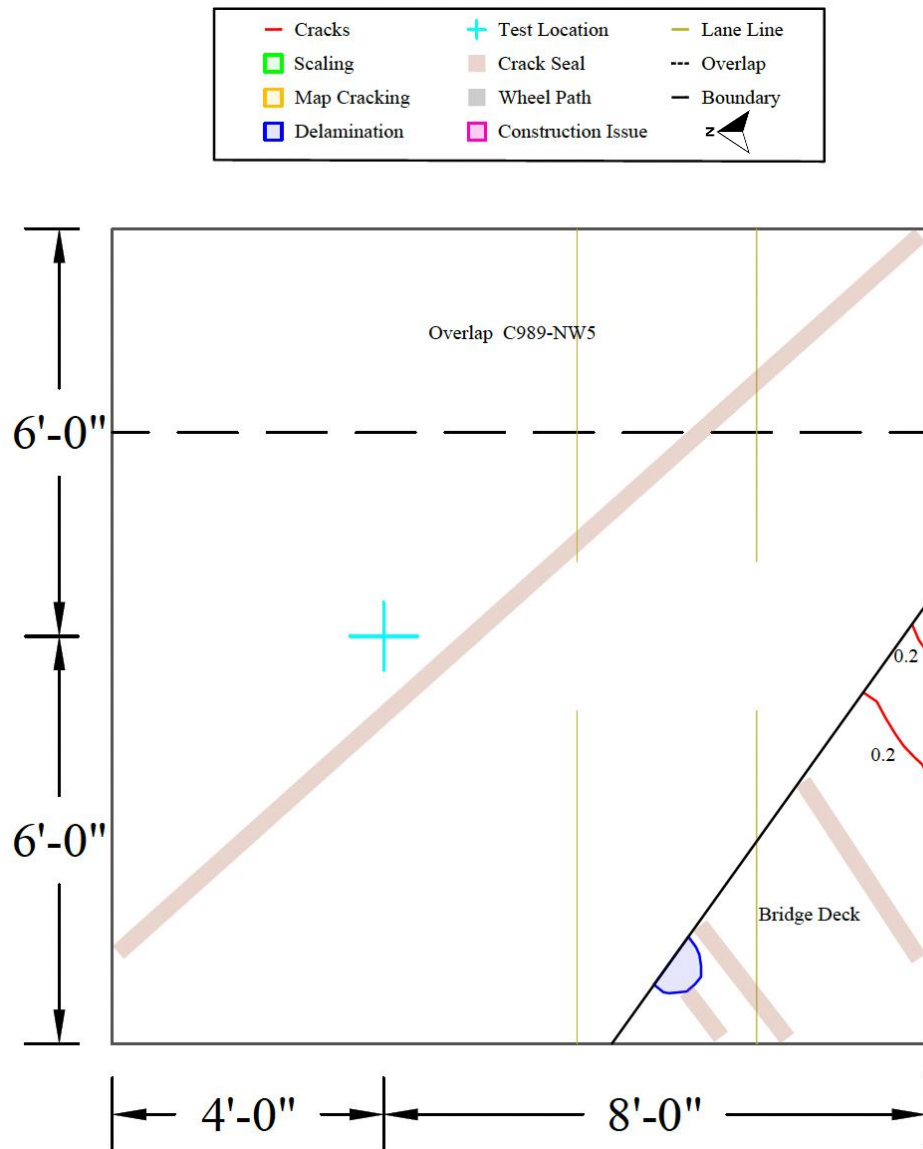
Test location 3 of normal-weight concrete approach slabs at bridge C-989.
